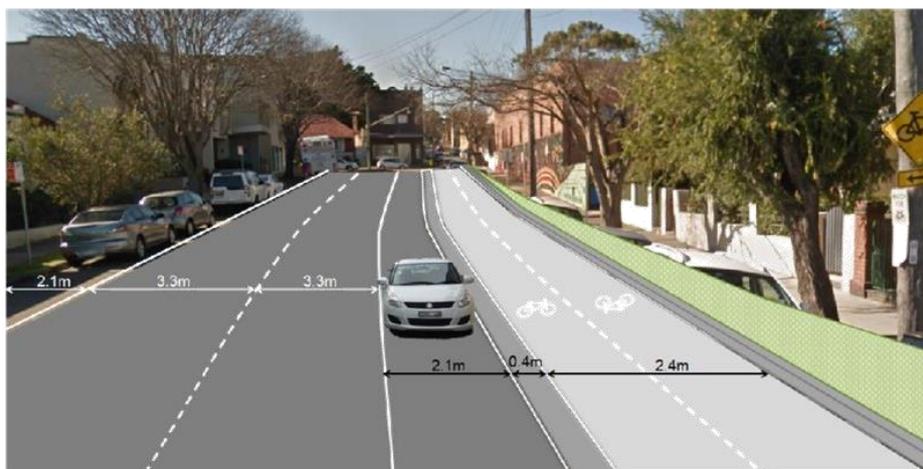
typical example of separated bi-directional cycleway with retained parking.
